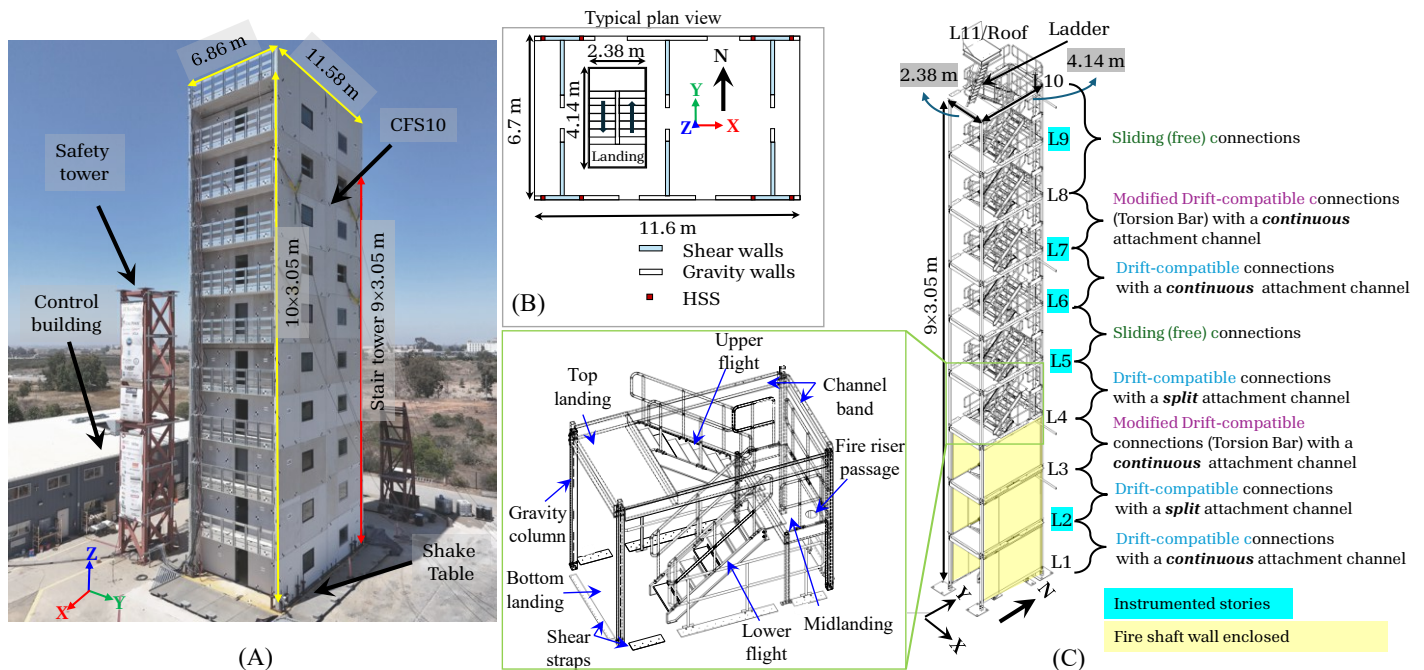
(A) CFS10 isometric view, (B) typical plan view and (C) stair tower and configuration (note: various connection types are color coded).
